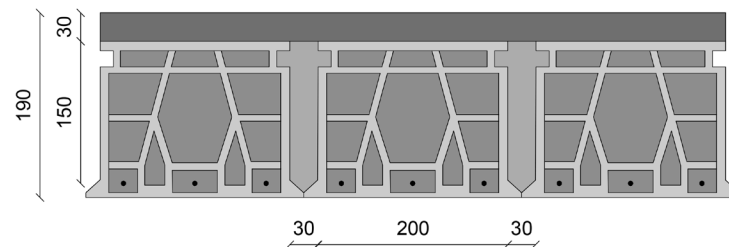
Lightweight ribbed one-way reinforced concrete slabs strengthened by means of UHPFRC overlay.
